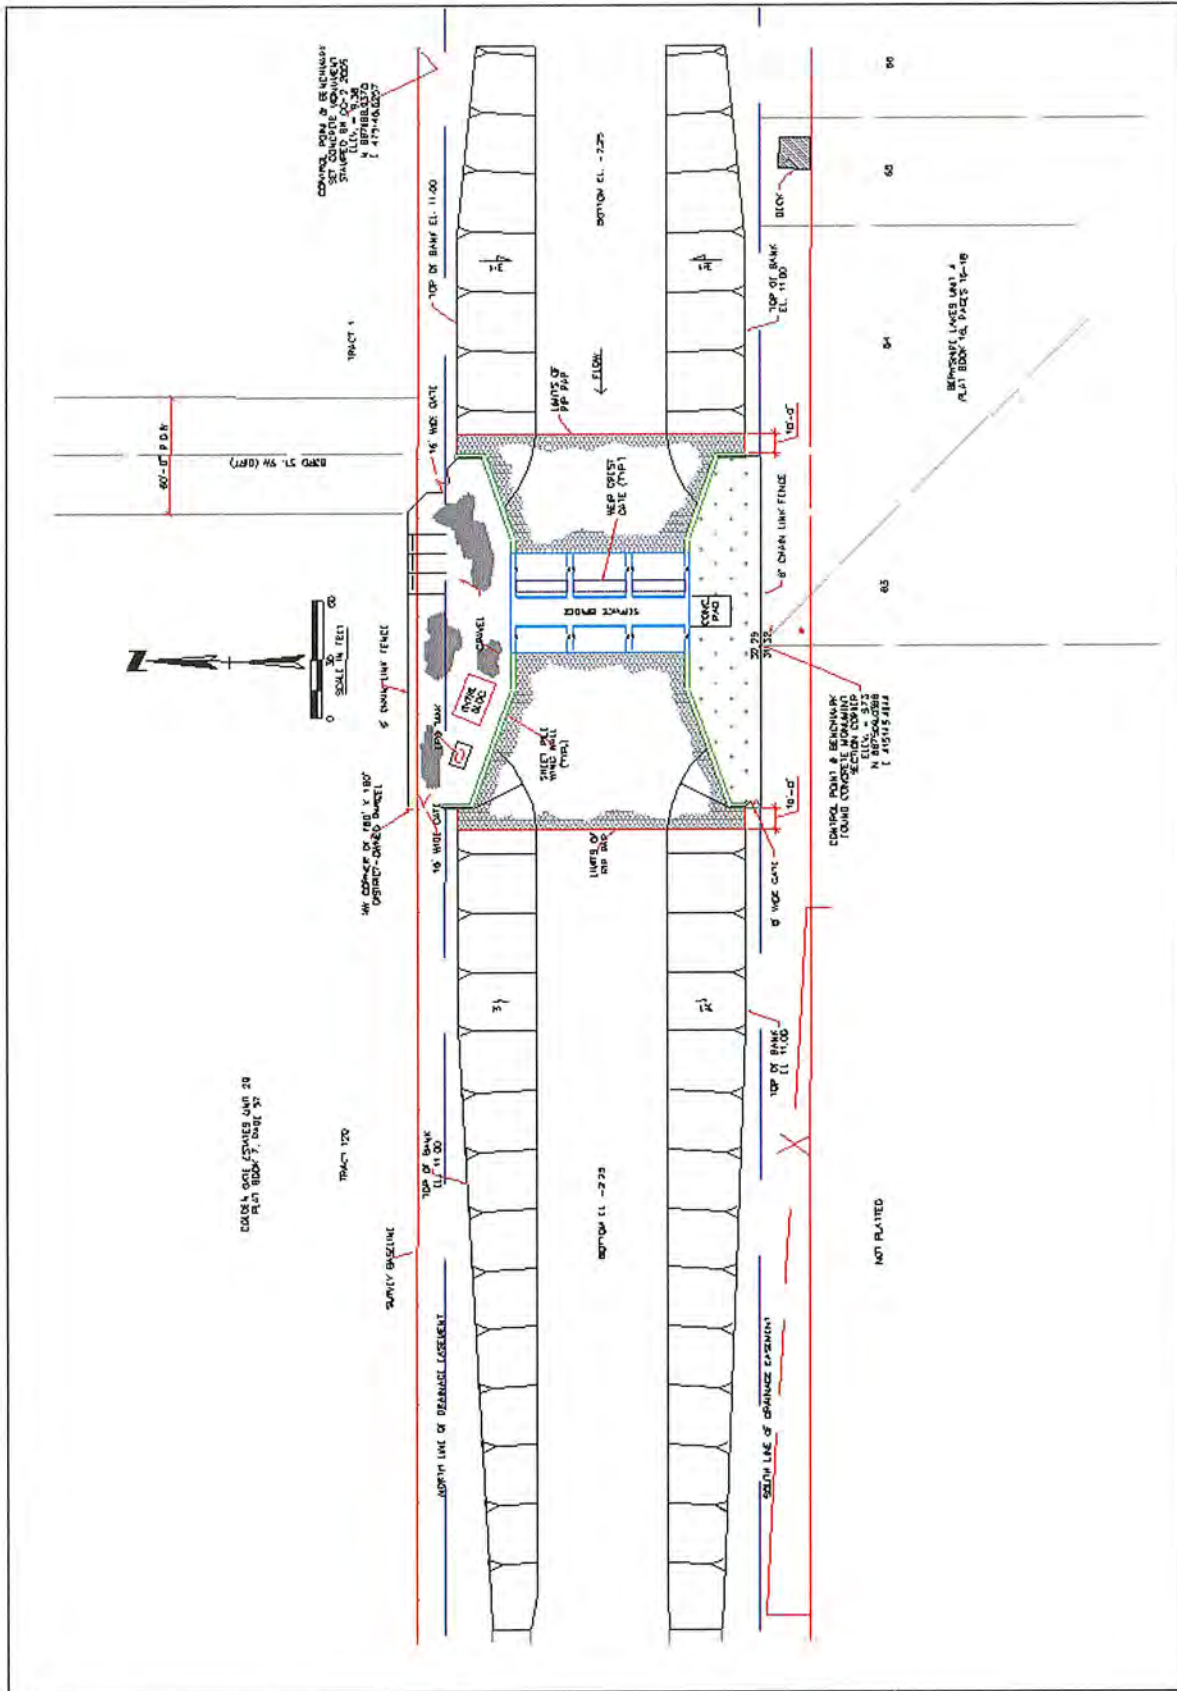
Proposed GG-2 Structure Site Plan (Elevation in ft NGVD)
